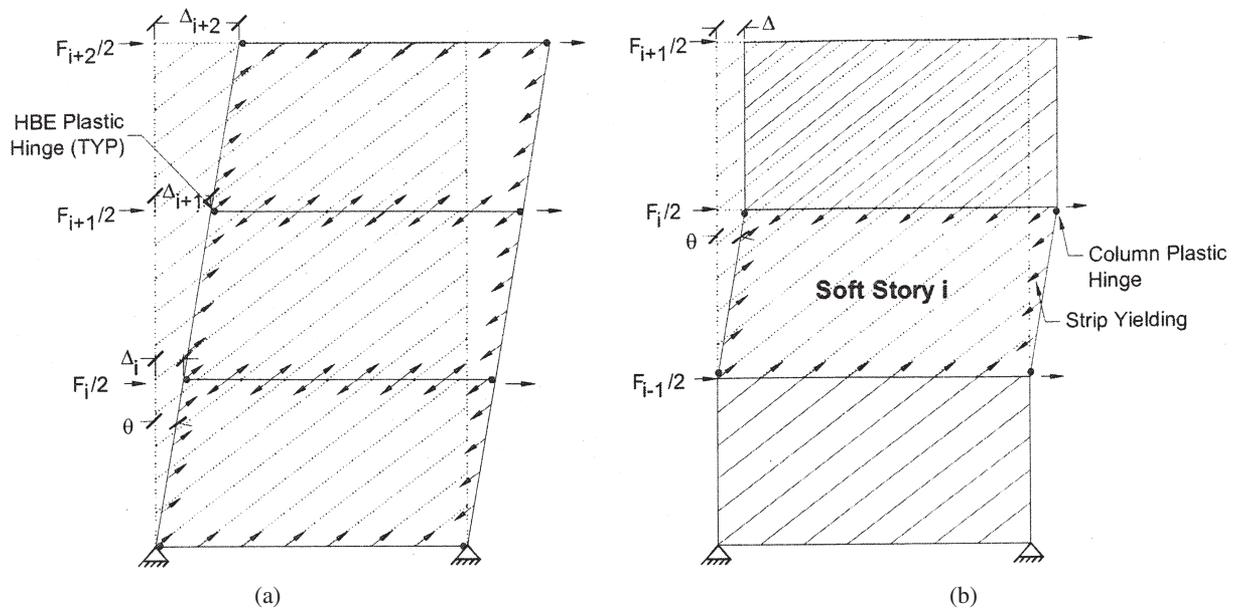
SPSW Collapse Mechanisms: (a) Uniform Yielding Mechanism and (b) Soft-Story Mechanism.
